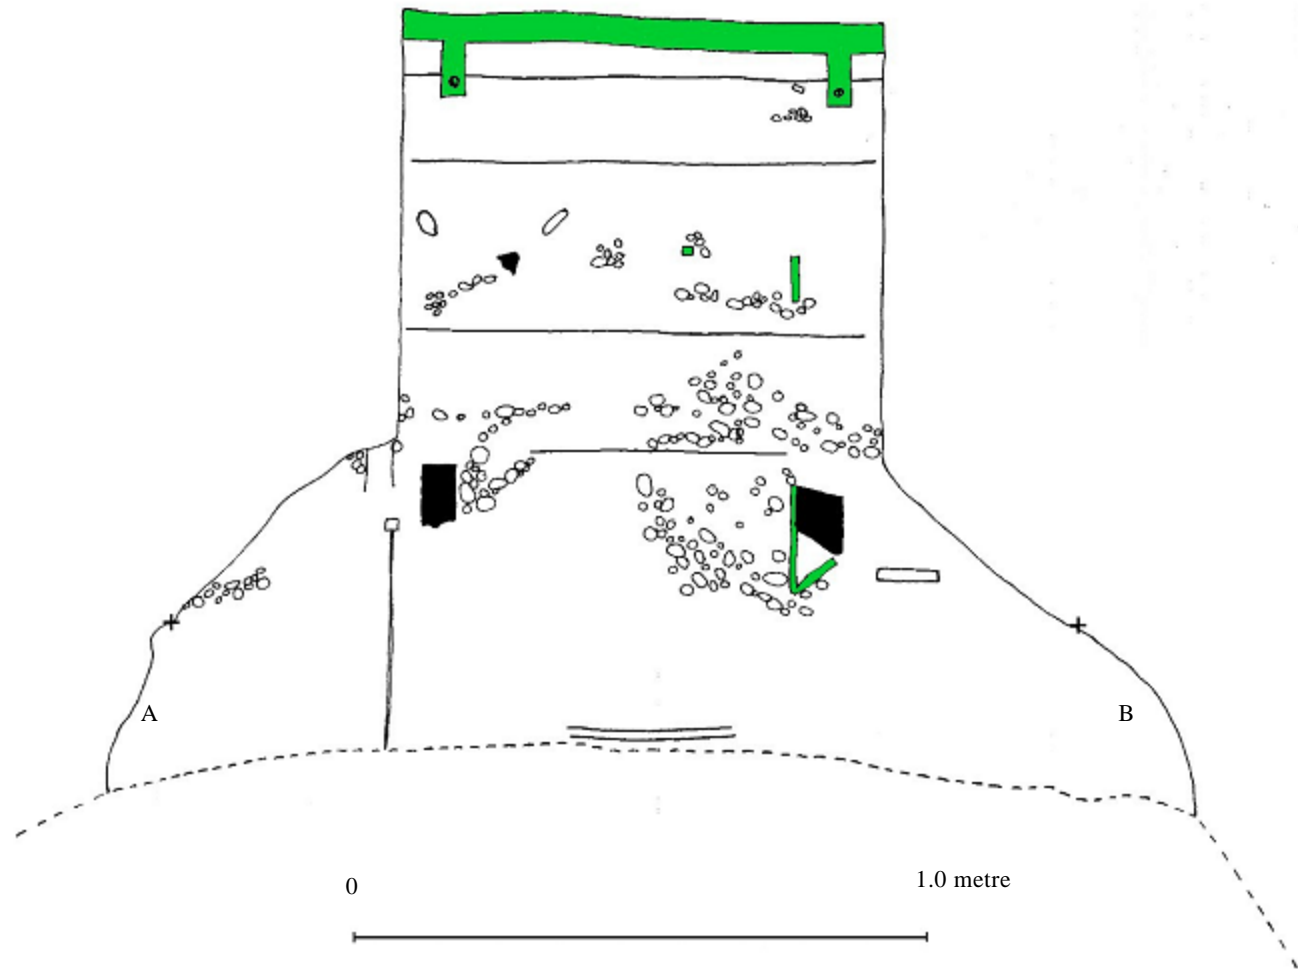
East facing elevation of the ventilation shaft at St Luke's
